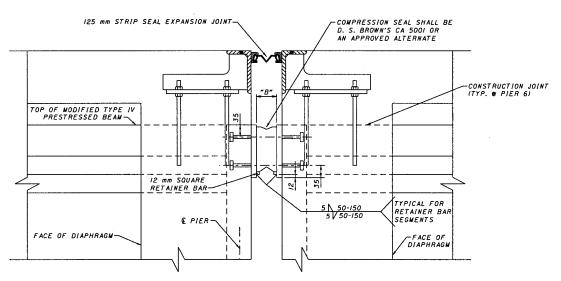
Pier 6 Expansion Joint (redundant compression seal)
